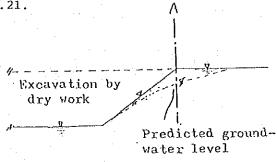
Water Level insde Testing Testing Canal Facility
